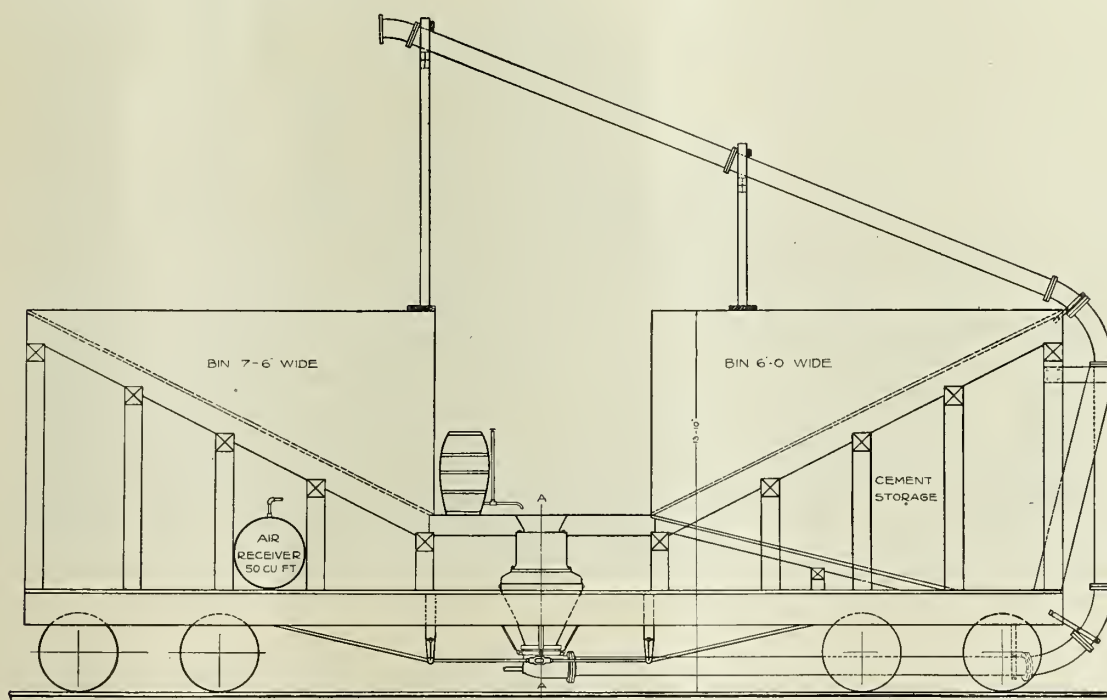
General Arrangement of Car Equipped with Pneumatic Concrete Mixer for Tunnel Lining, C., B. & Q. R. R.
